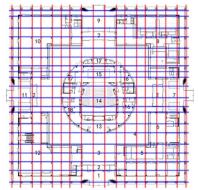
The Gride of Structural System – source: www.archdaily.com+ student work
